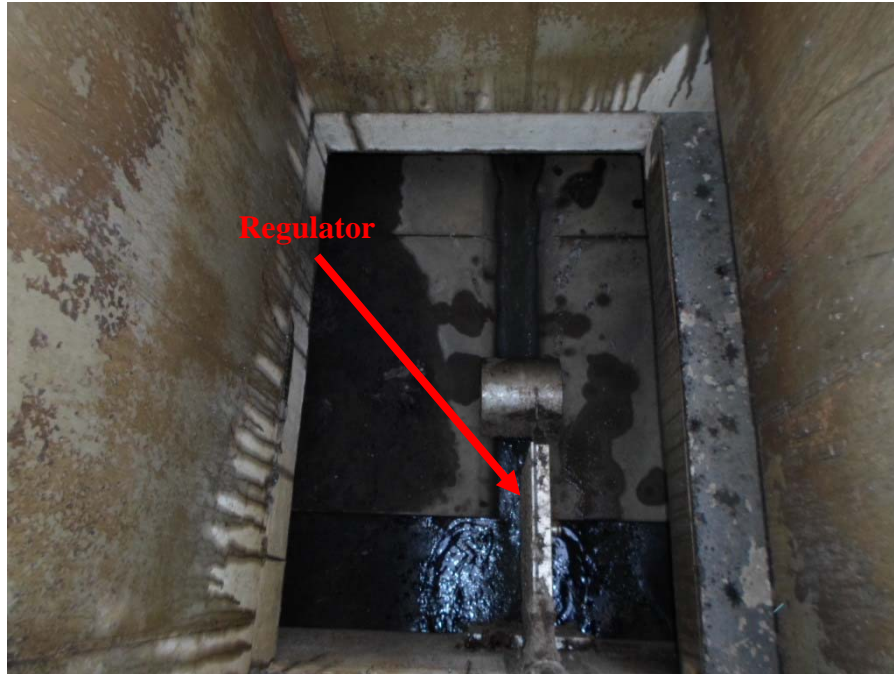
Morningside CSO Outfall #015 – View of downstream area above inline storage pipe.
